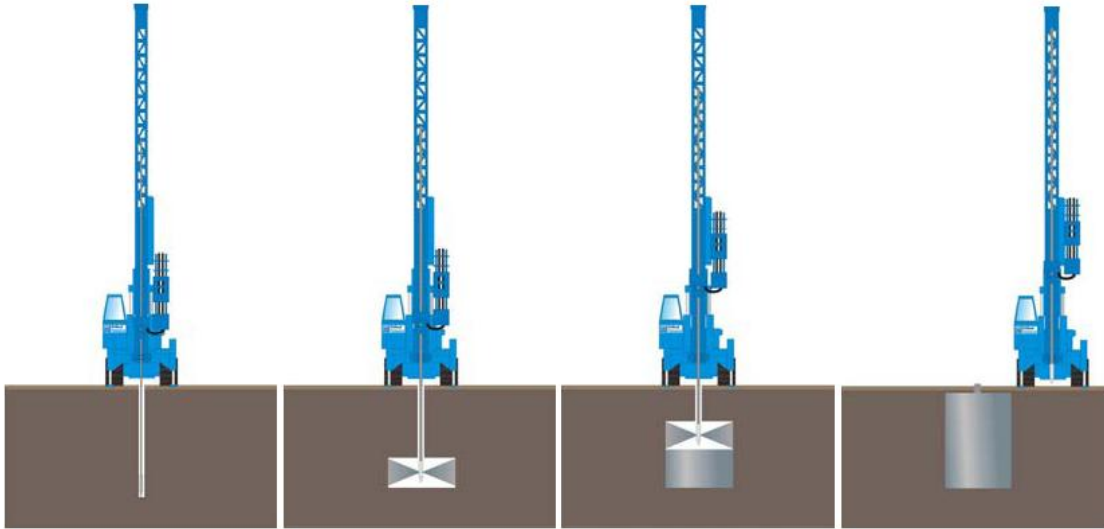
Schematic demonstration of jet-grouting practice (Küçükali, 2008).
